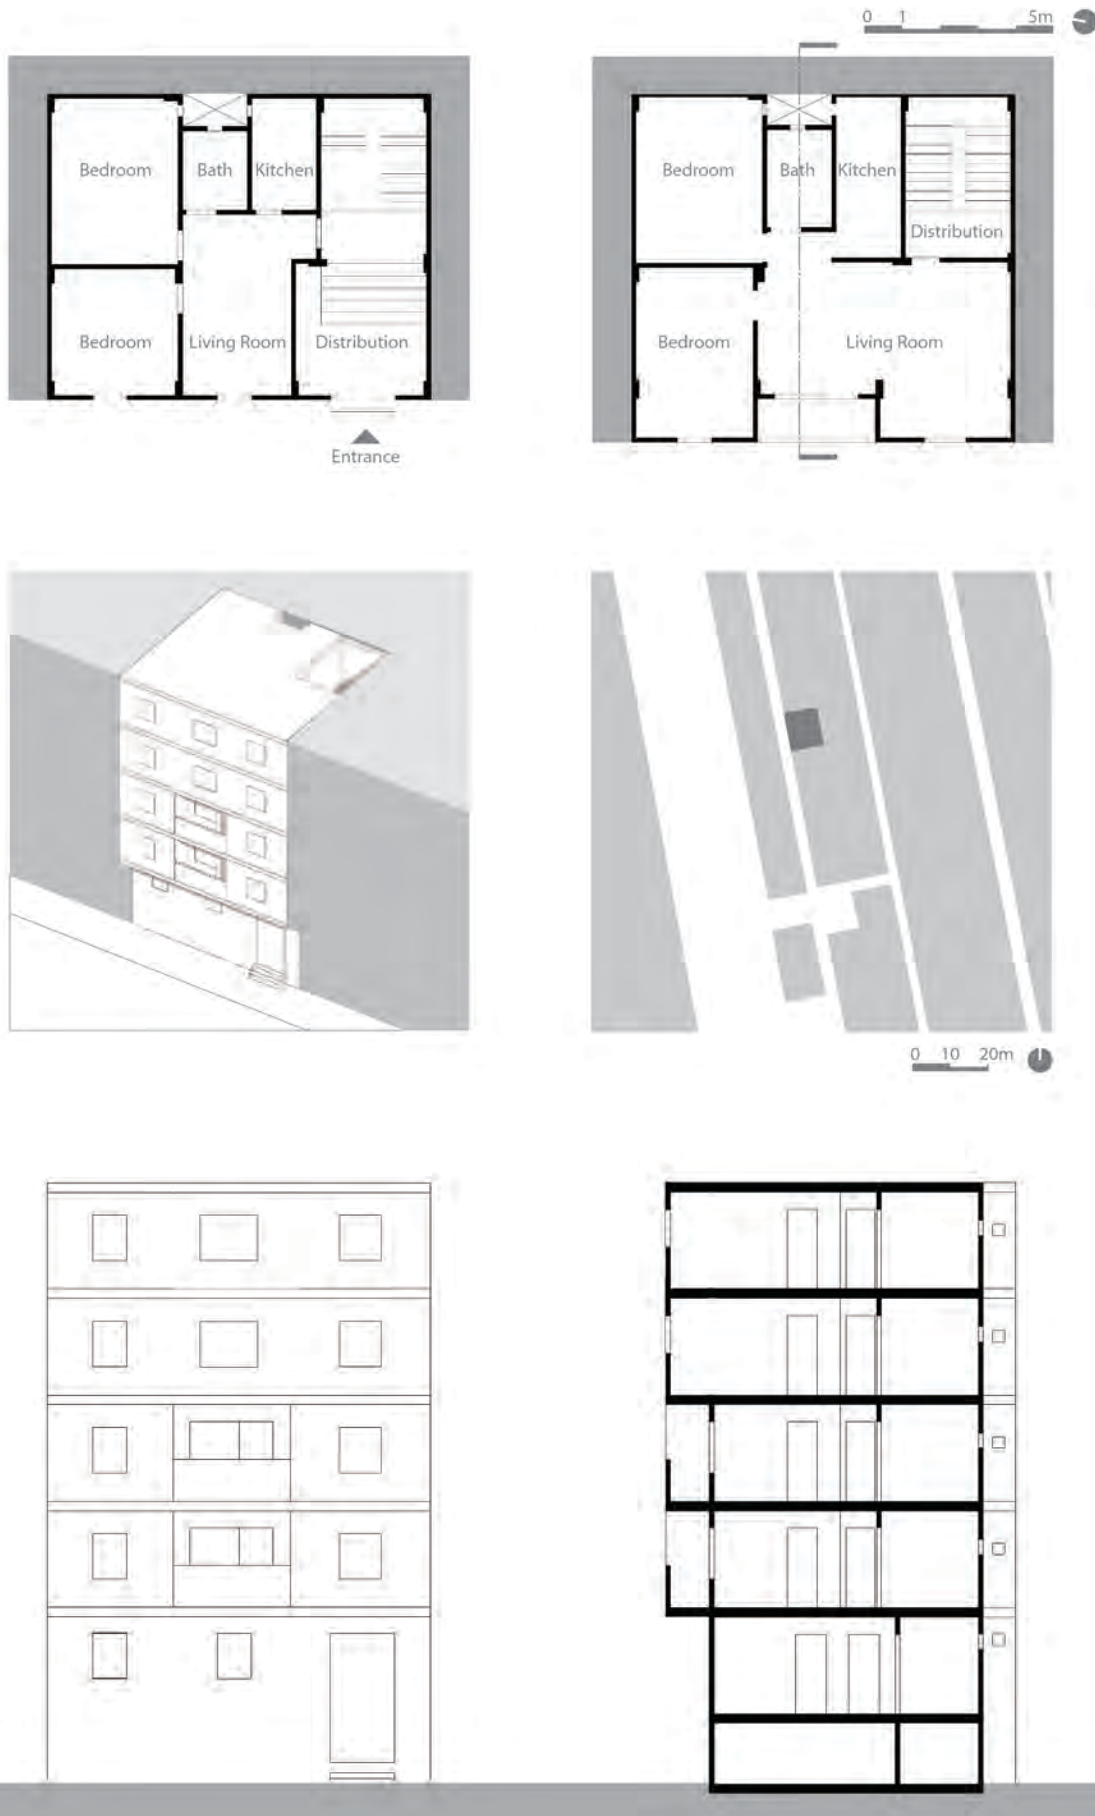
Abdullah’s Building – Ground floor, typical floor, perspective, context, elevation West, section West-East.
